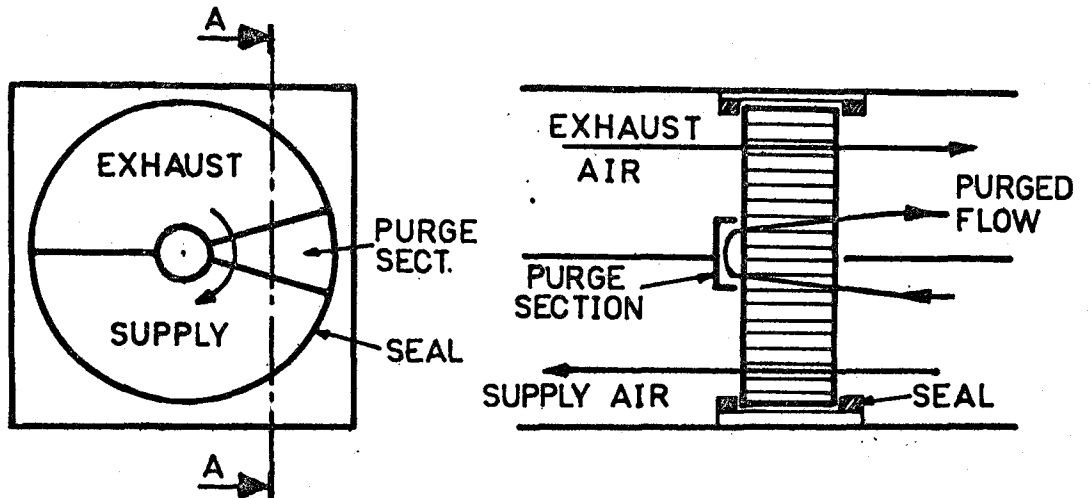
Rotary Regenerator Equipped with Purge Section to clear Contaminants from the Heat Transfer Surface.
